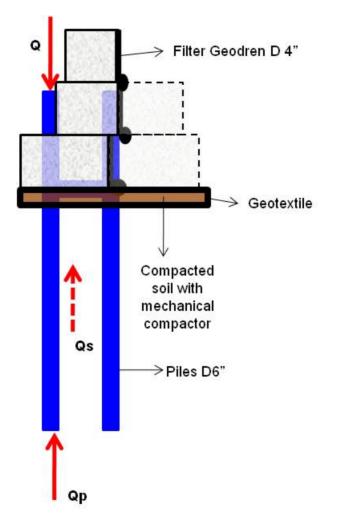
Retaining structure (gabions) founded on driven steel piles
